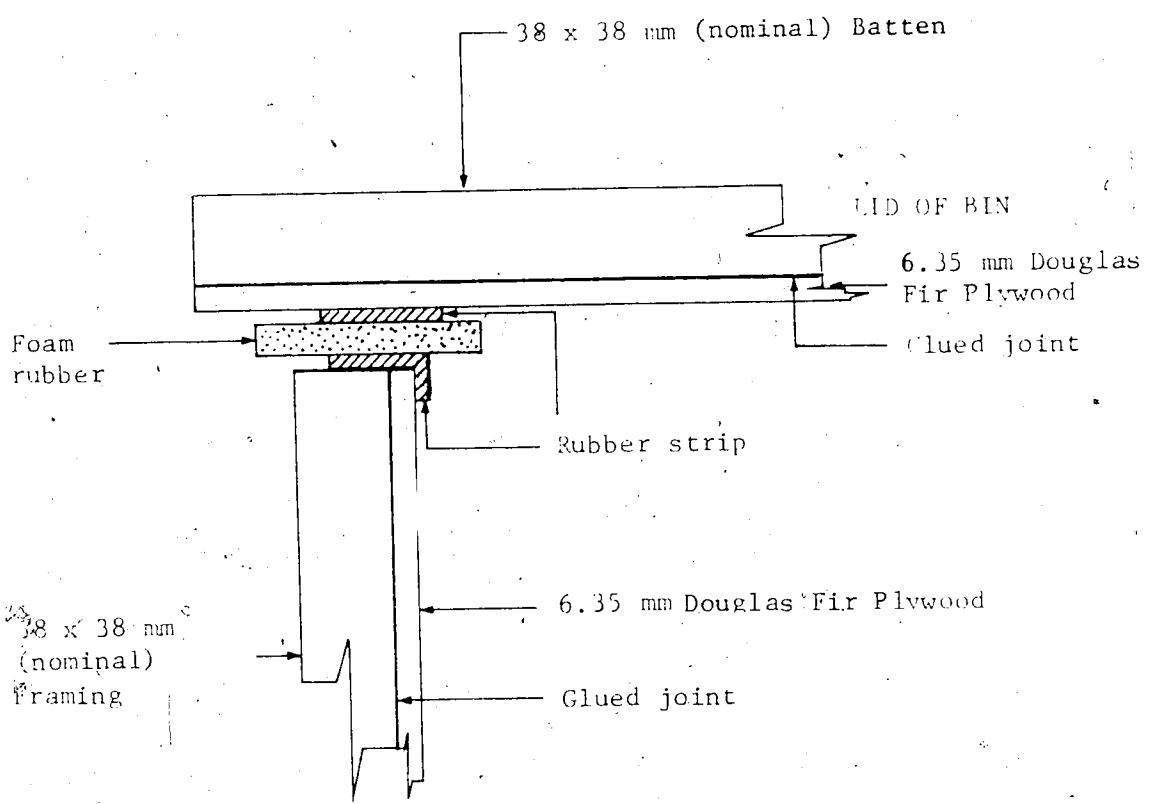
Detail of seal between plywood bin wall and the lid.
